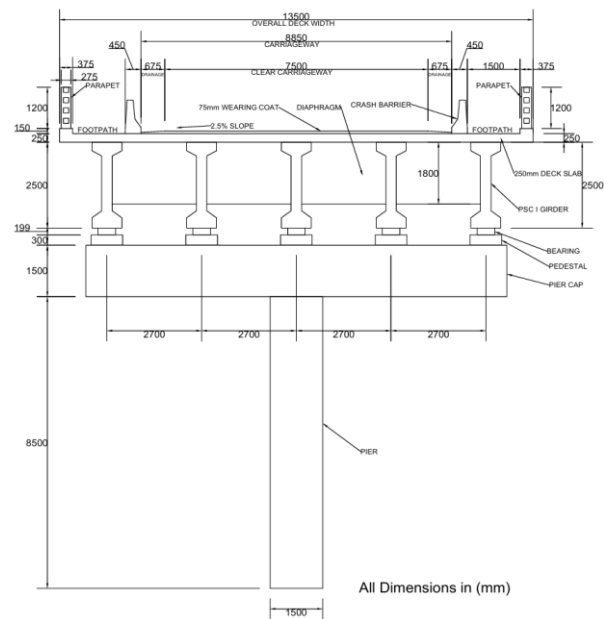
Structural Arrangement of PSC I-Girder Bridge
